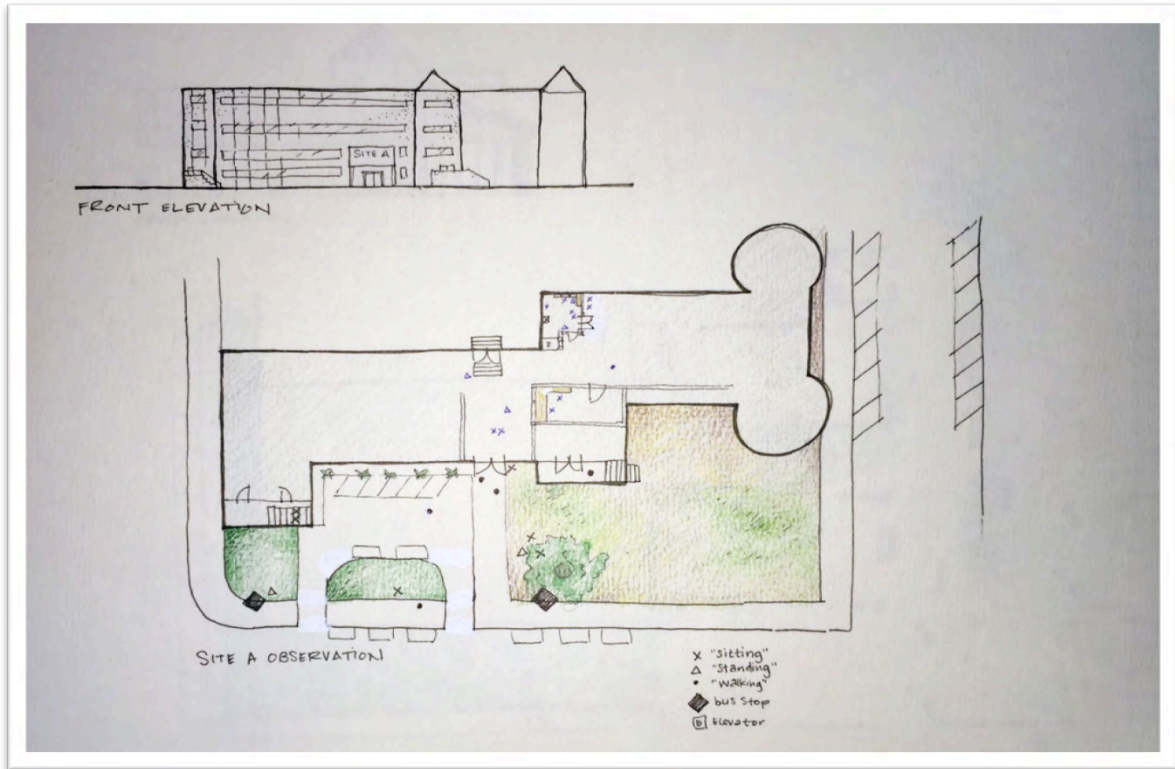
Site A – Front elevation and floor plan with behavioral mapping.
